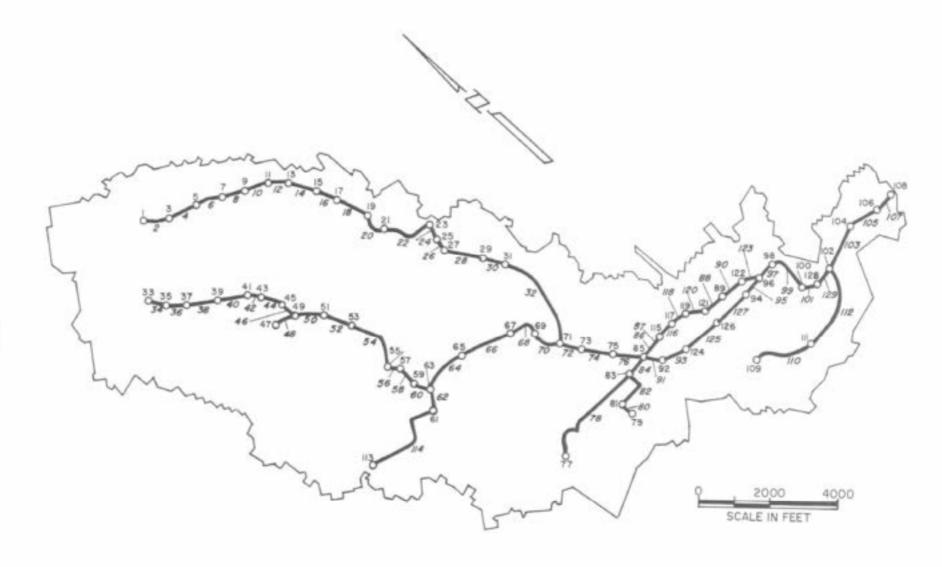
PLAN OF WINGOHOCKING SYSTEM
